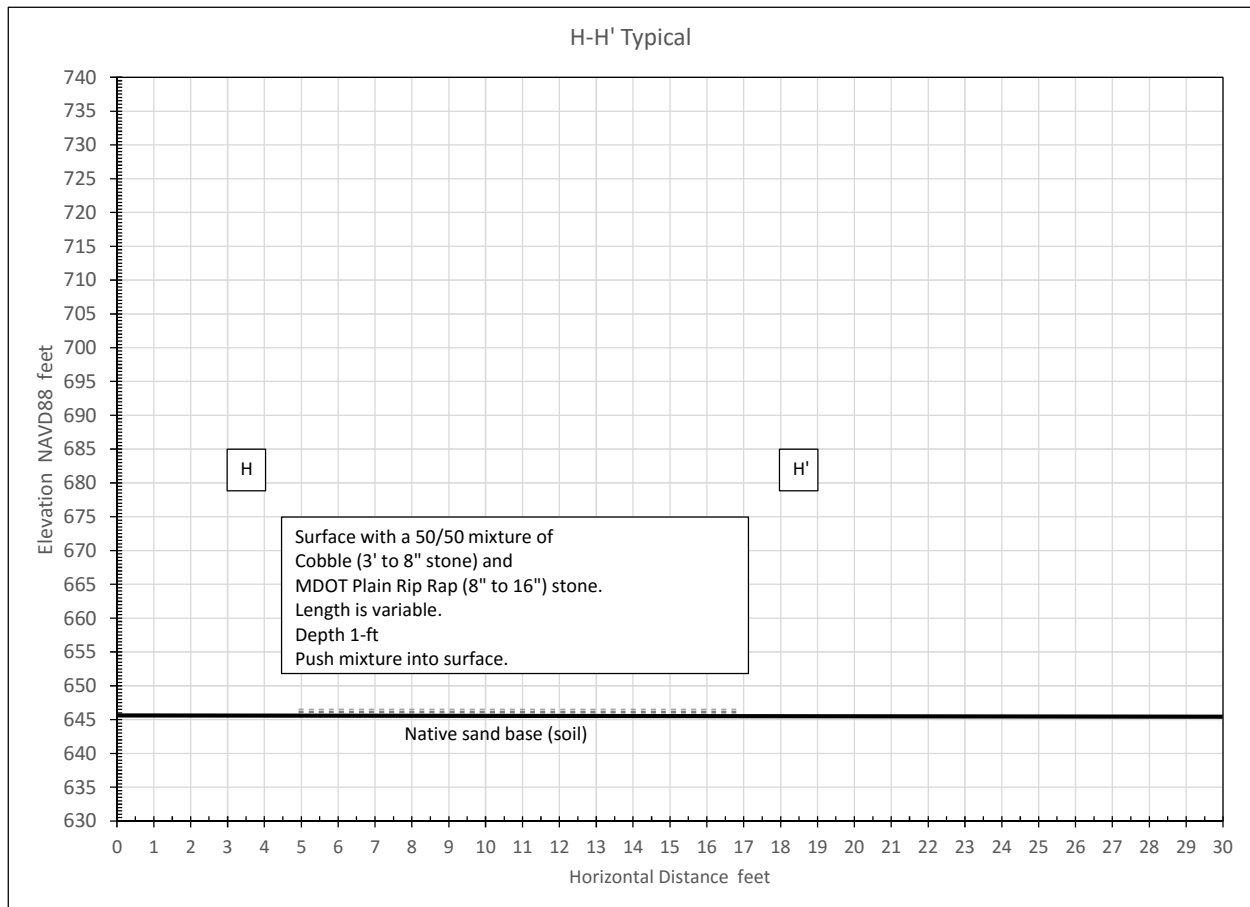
A typical cross section of sand roads on steep segments where a stable footing is required.
